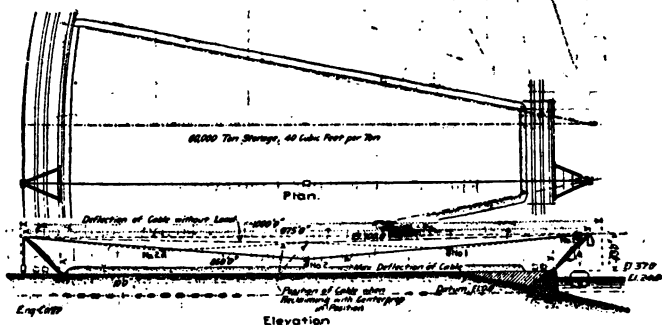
Cableway in Which Sag in Cable is Practically Done Away with by Oscillating Towers.
